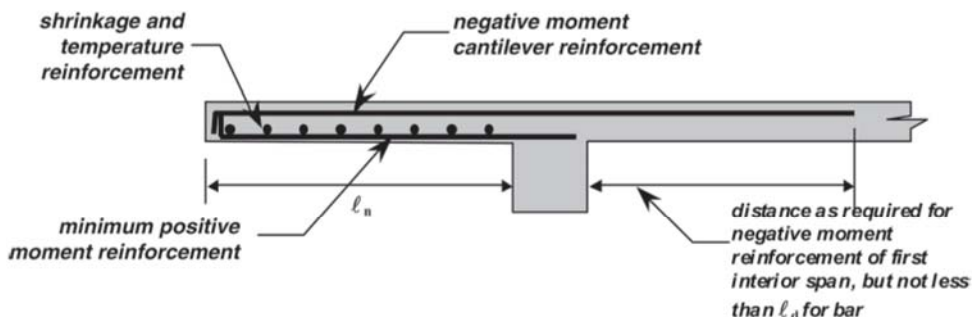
Reinforcement for slab cantilevers.
